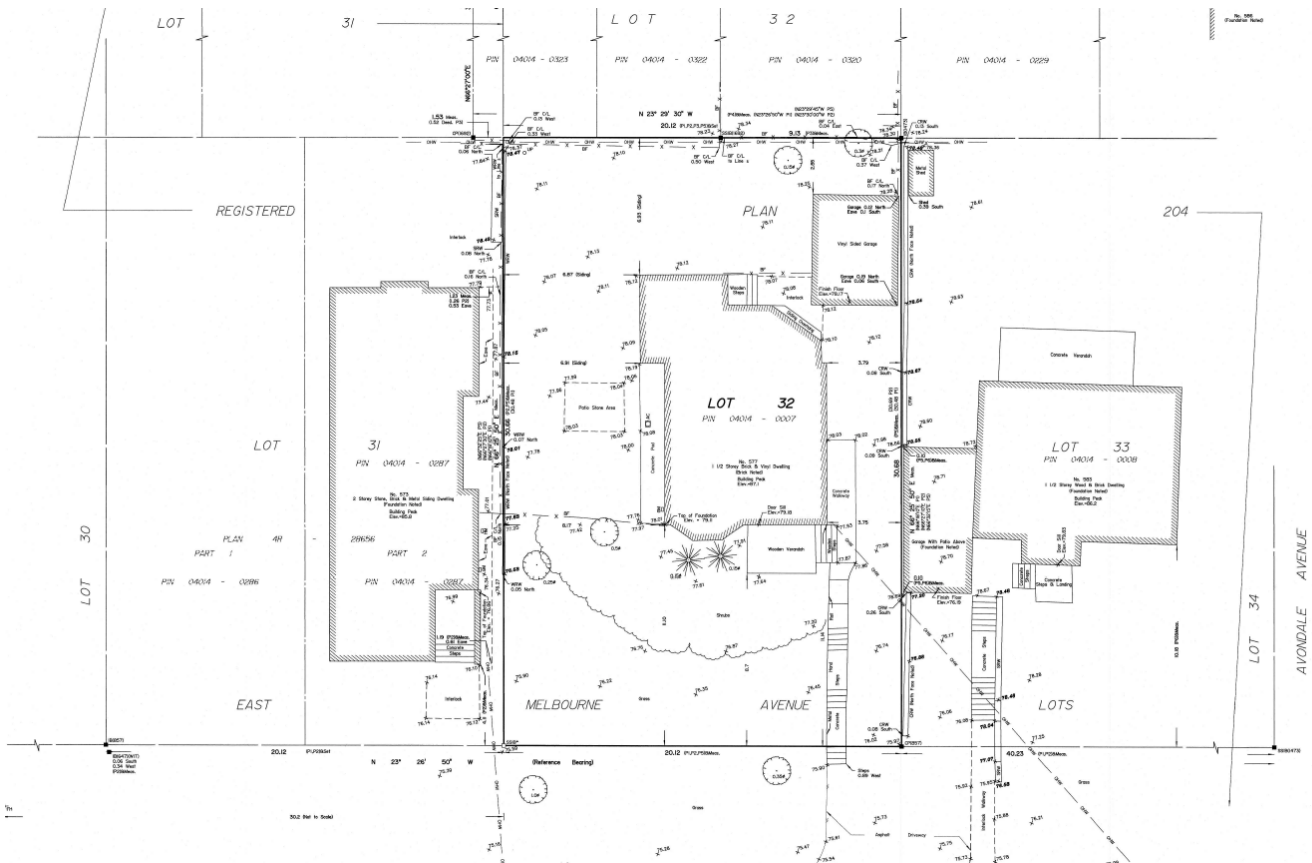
Plan of survey of the subject property showing the existing development on the site.
